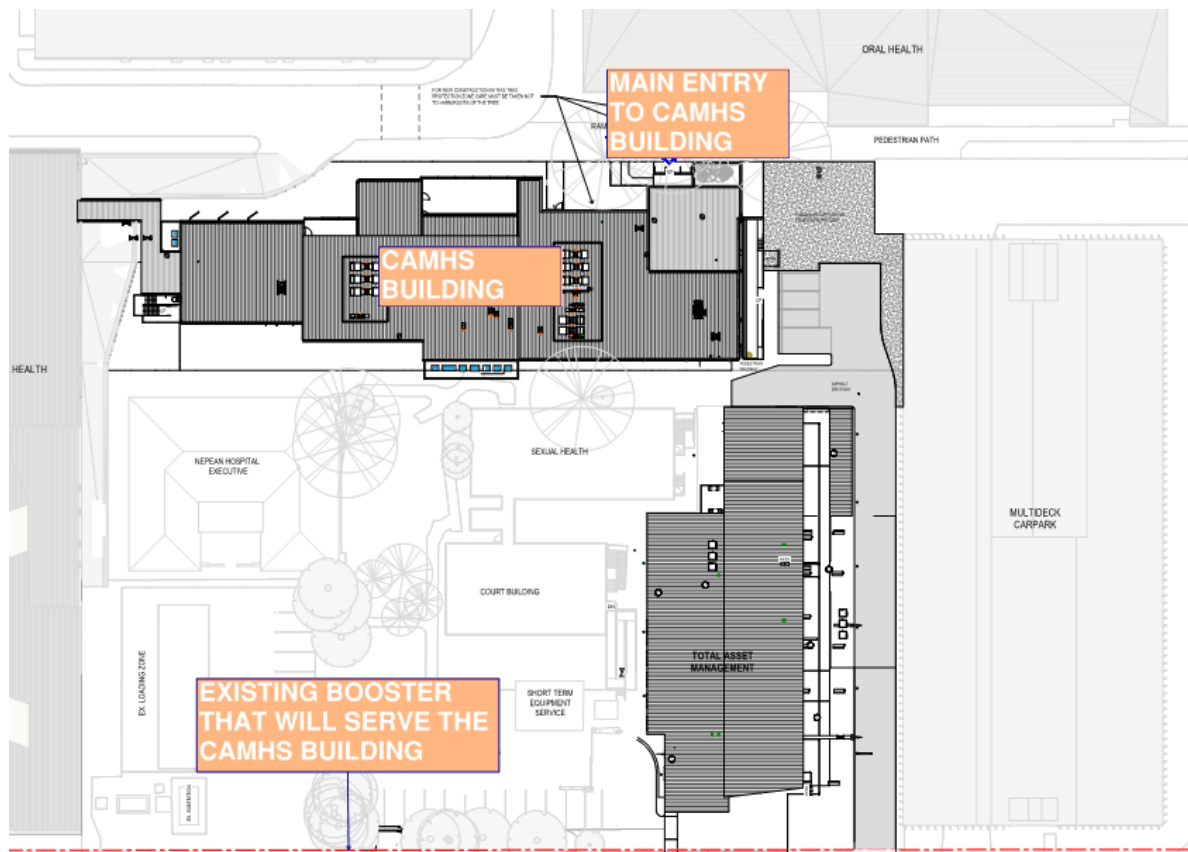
Location of existing sprinkler booster in proximity to the main entry to CAMHS Building
